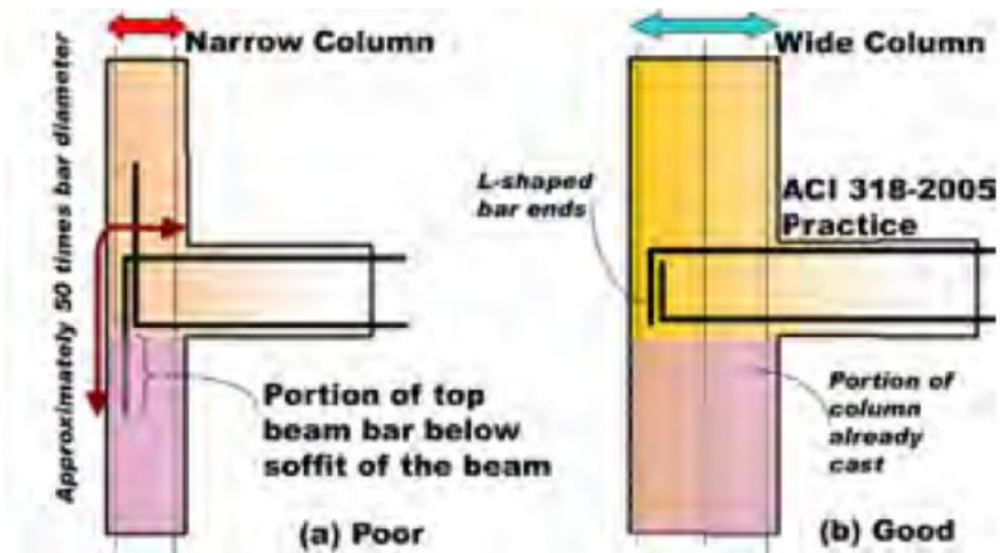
Detailing of Frame Joints (Detail-1)
